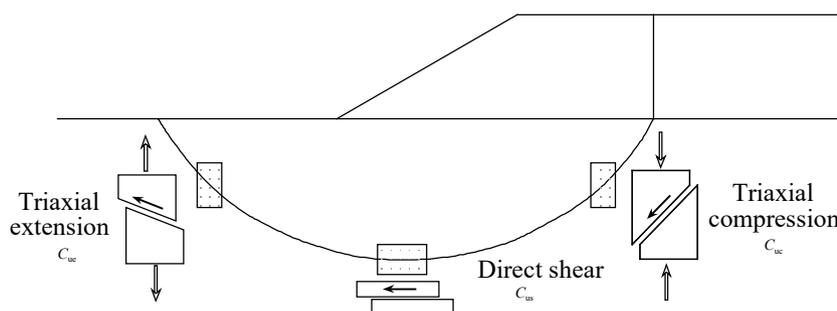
Stability Problem and Strength Anisotropy of Earth Fill Constructed on Cohesive Soil Ground
